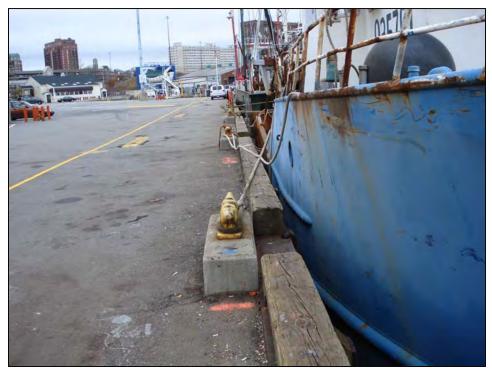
Overview of the Wharf and fender system from Station 5+09 looking northwest.
